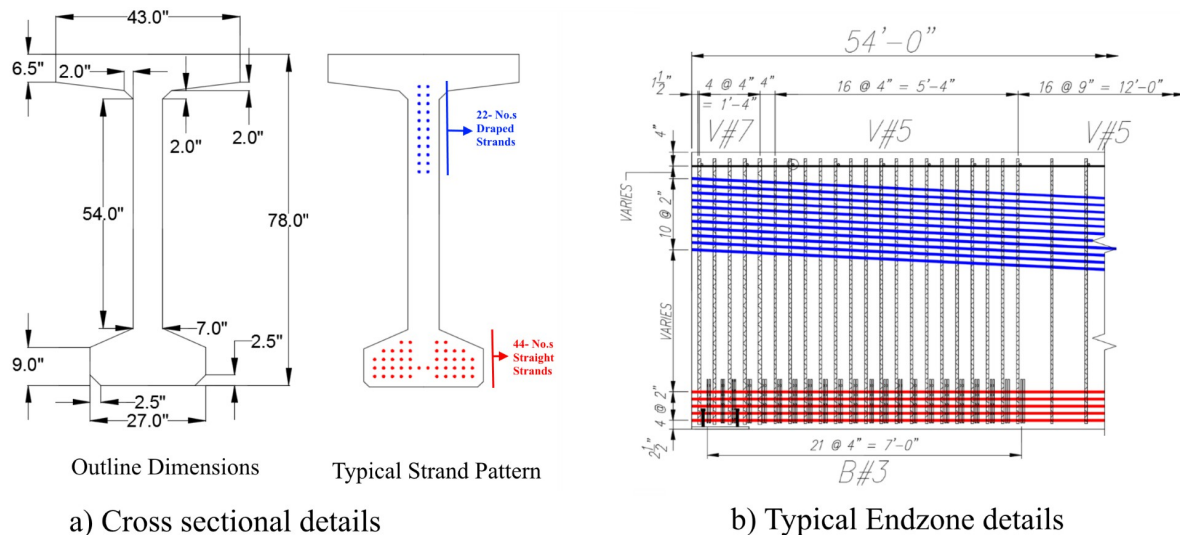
Cross-section and end-zone details of standard BT-78 girder
